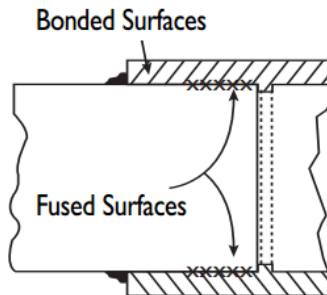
Solvent bonded PVC pipe and fitting with bonded and fused surfaces. [83]
